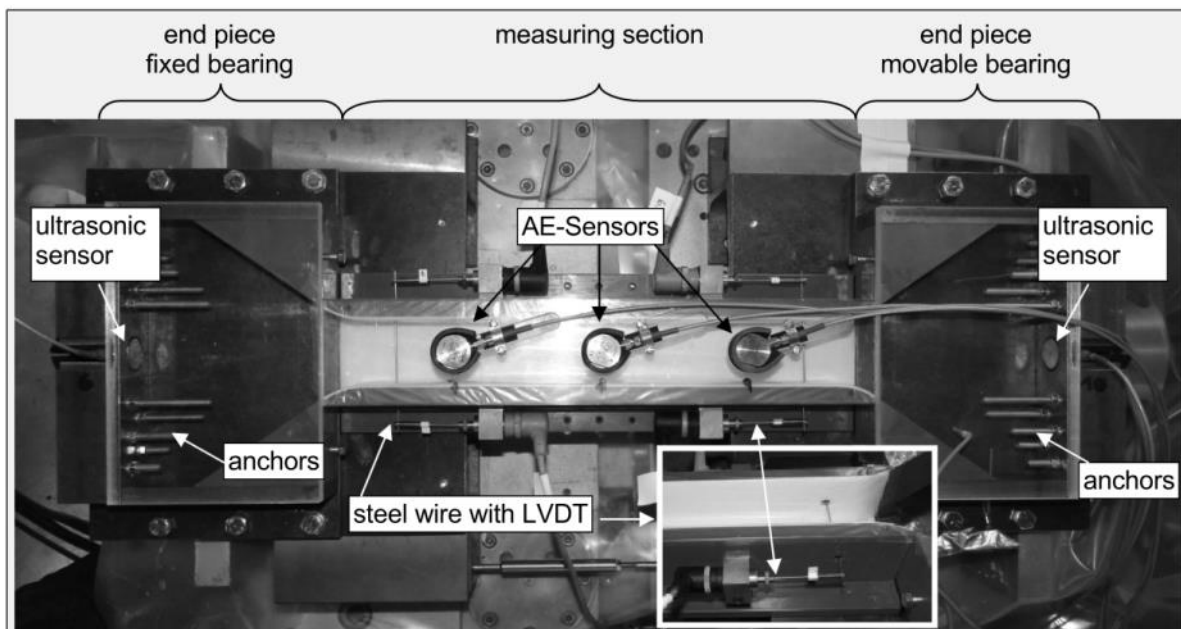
Instrumentation with rod crossing the sample and external support bearing the displacement sensors [73]
